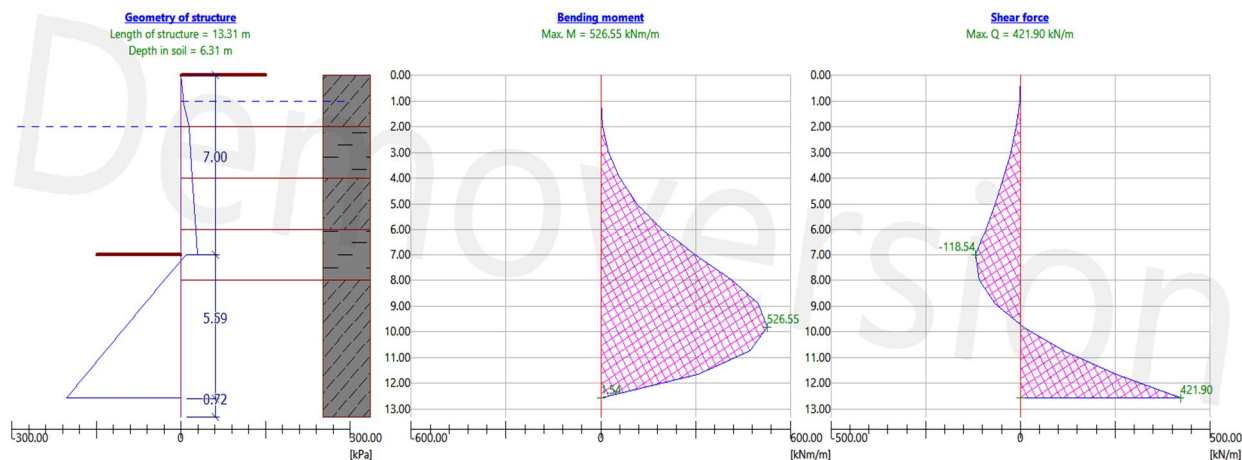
Model 6: U-section sheet pile wall for 7m depth of ditch in 2 layer soil
